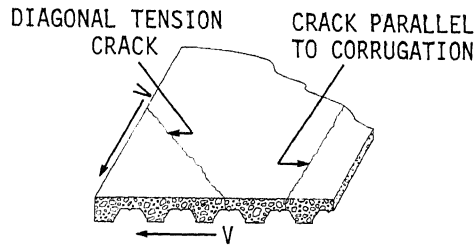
Failure by shearing of the concrete in a) diagonal tension and b) cracks parallel to the corrugations (Failure Mode 1a-1 and 1a-2 in Table 1).
